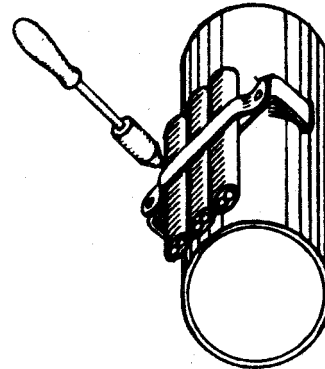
NEVER use an open flame for soldering cable to cable clamp. Use heavy iron, and apply wet rag for rapid cooling.
